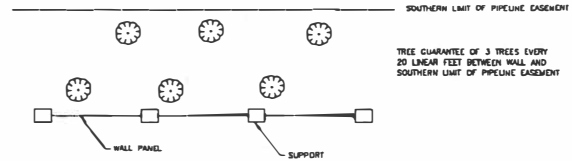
BAYPORT NORTH SHORE SOUND ABATEMENT WALL-DETAILS\
